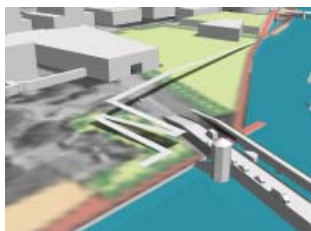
Option 4 – Cass/CSX Bridge: over bridge elevated ramp system.
